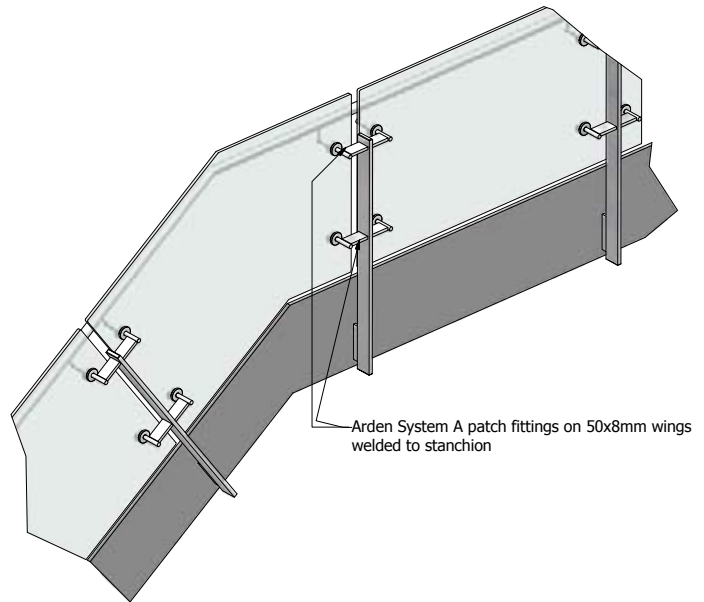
W4 balustrade on cranking plate steel stringer: isometric overview.
